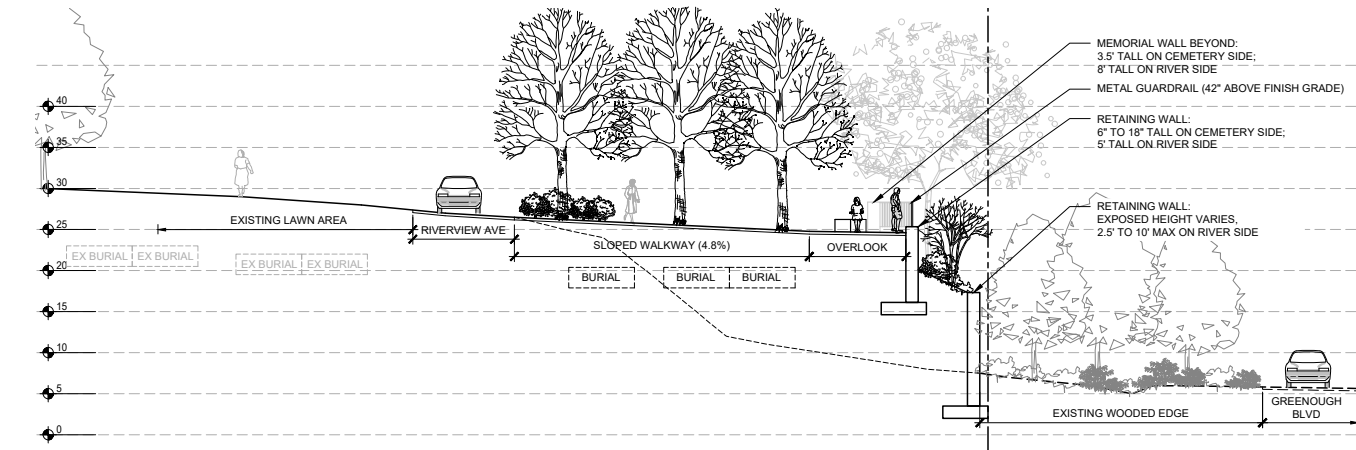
Riverview Avenue conceptual expansion plan and site section.
